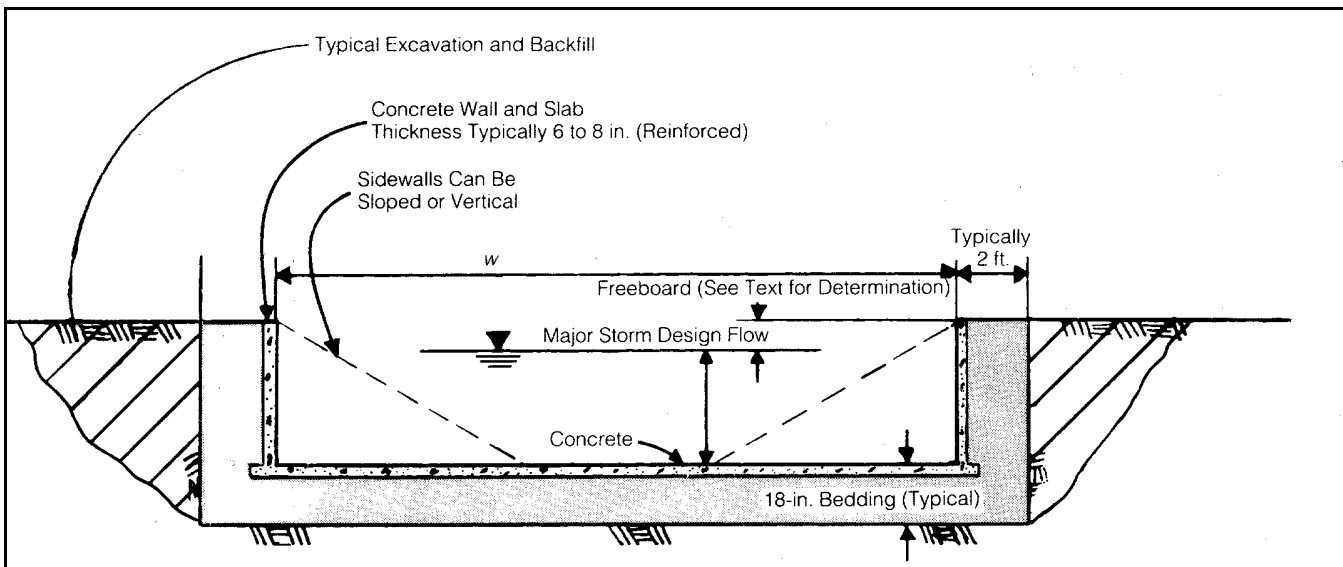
Schematic of channel with concrete lining (Source: ASCE Urban Stormwater Manual)
